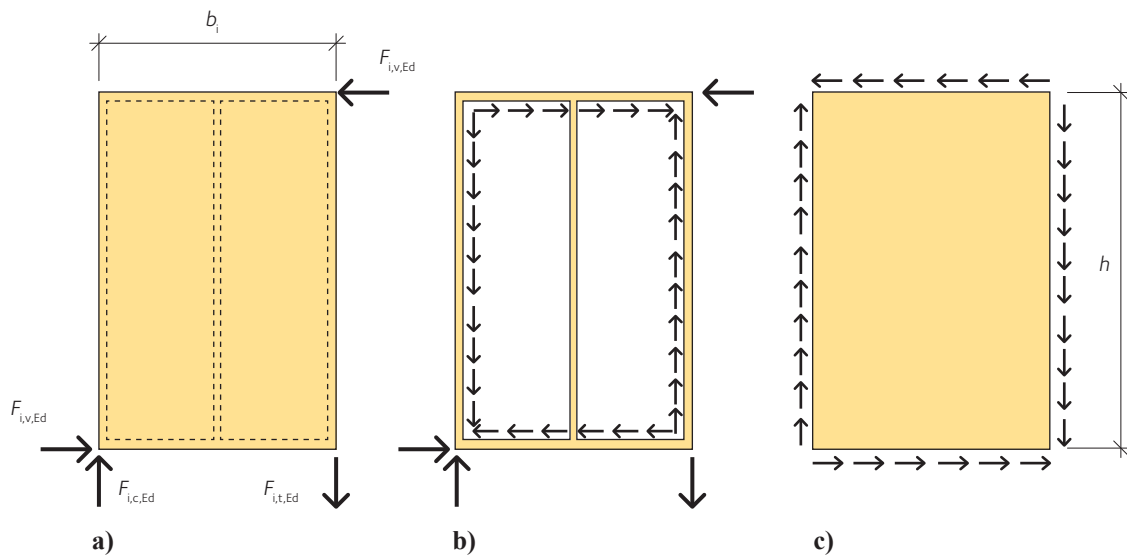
Forces acting on a) wall panel; b) framing; c) sheathing in wall diaphragm.
